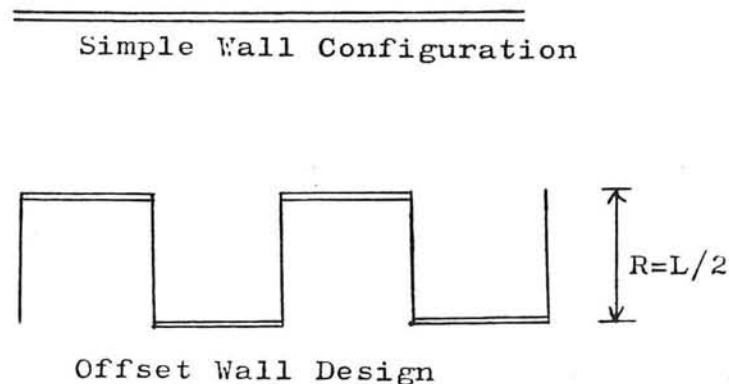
Plan view of breakwater design. Waves approaching from top of the page.
